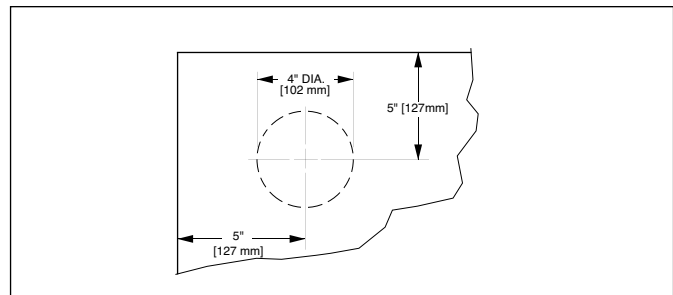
INSTALLATION WITH KWIK CONNECT WALL ELBOW
